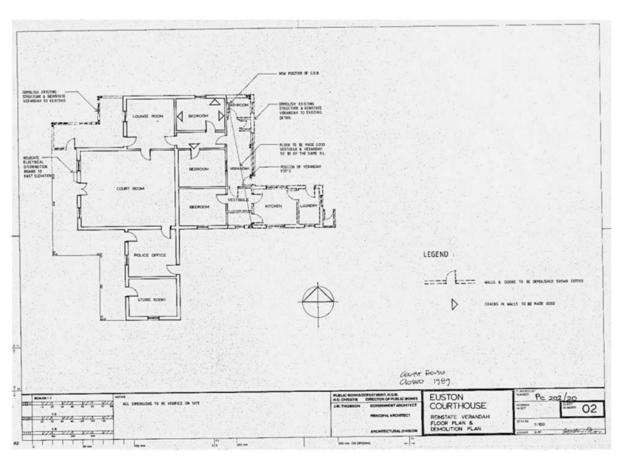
Euston Courthouse, Plan Station + Residence Demolition Plan 1989
